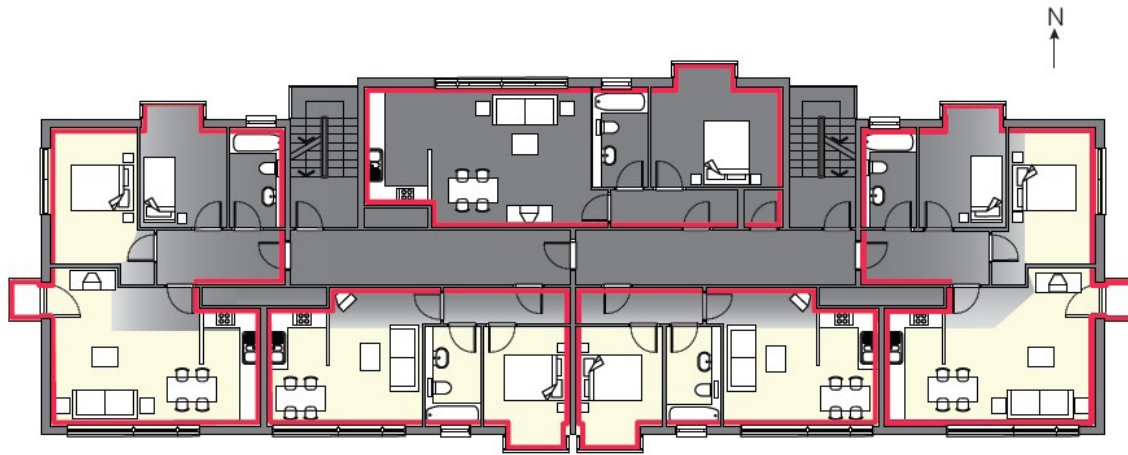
Careful layout design means that four out of the five flats shown have a south-facing living room
